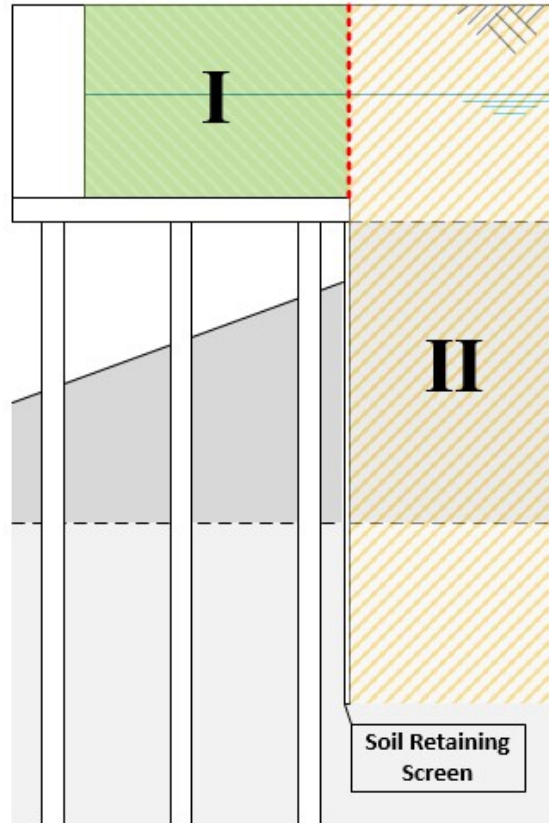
a) I: Soil directly behind the masonry wall; II: Soil behind the foundation structure.
